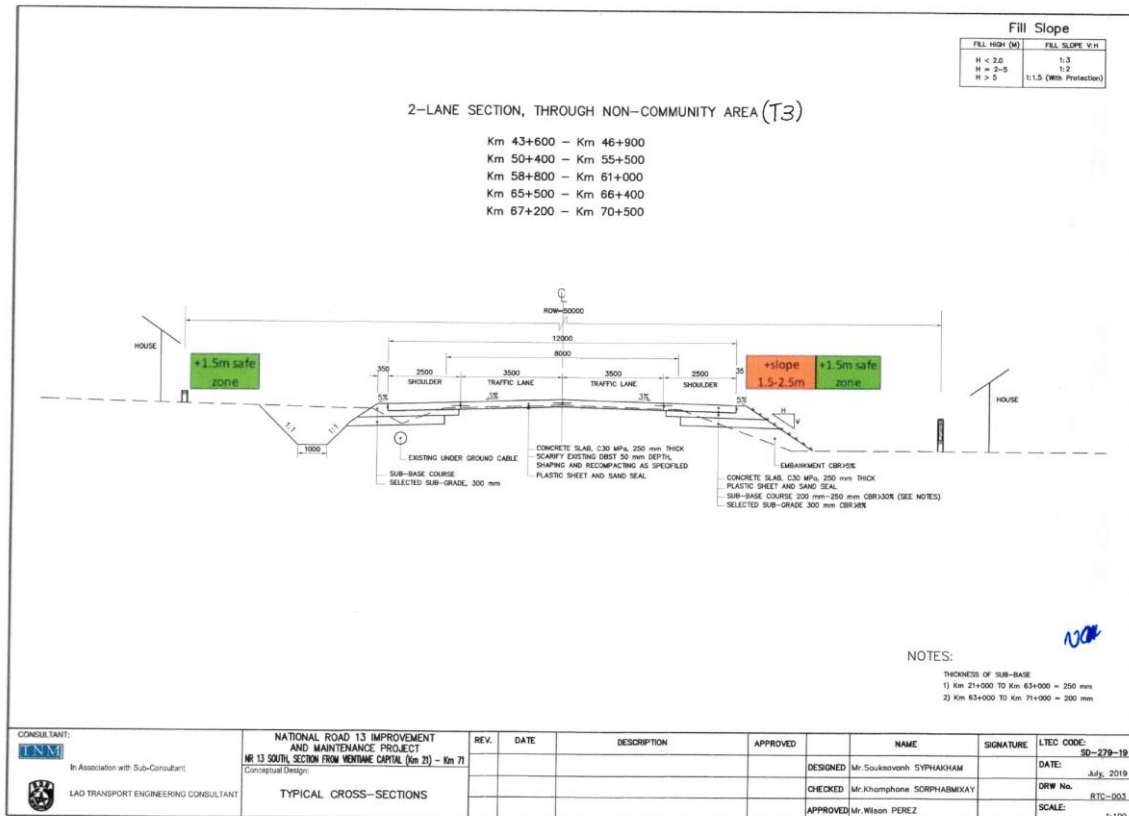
Typical Cross-Sections of 2-Lane Section through Non-Community Area (T3)
